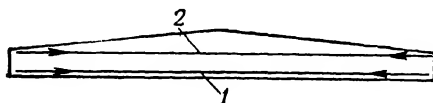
Scheme showing the disposition of tendons in a double-pitch girder
